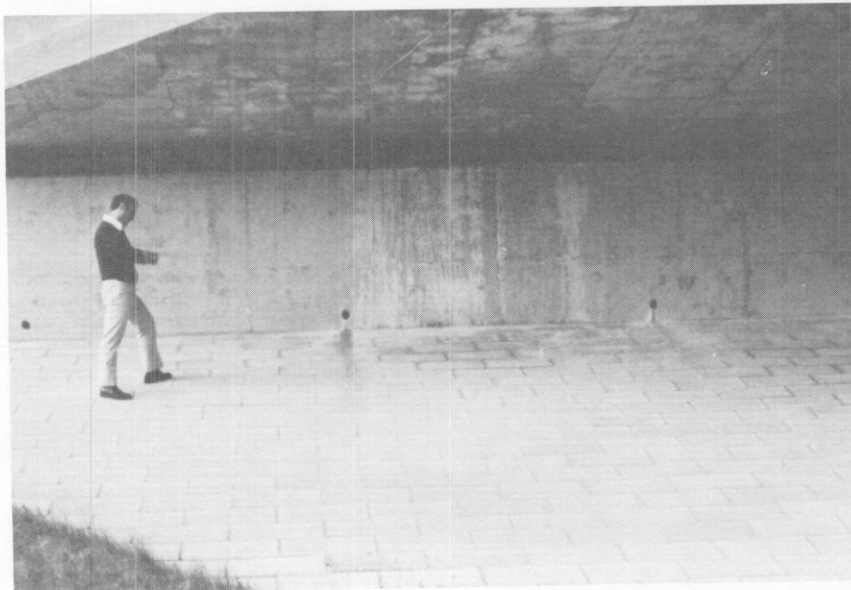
Abutment No. 1 of Evergreen Parkway Structure
